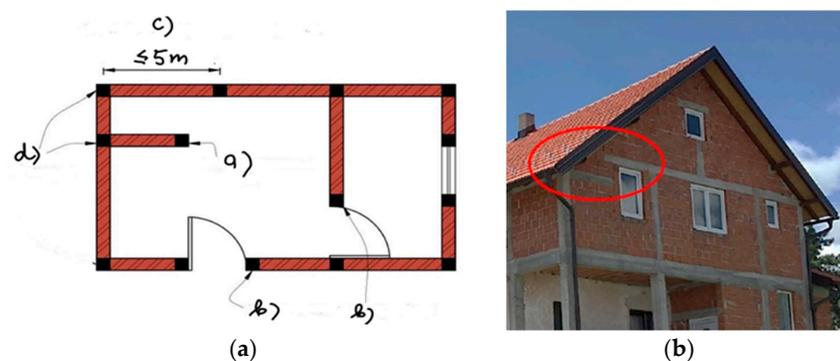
Confining elements in CM buildings: (a) a typical floor plan showing the locations of RC tie columns and (b) a discontinuous RC tie beam (an example of an inadequate construction practice). (Red ellipse shows the discontinuity of horizontal confining elements what is serious structural mistake in this case of CM building).
